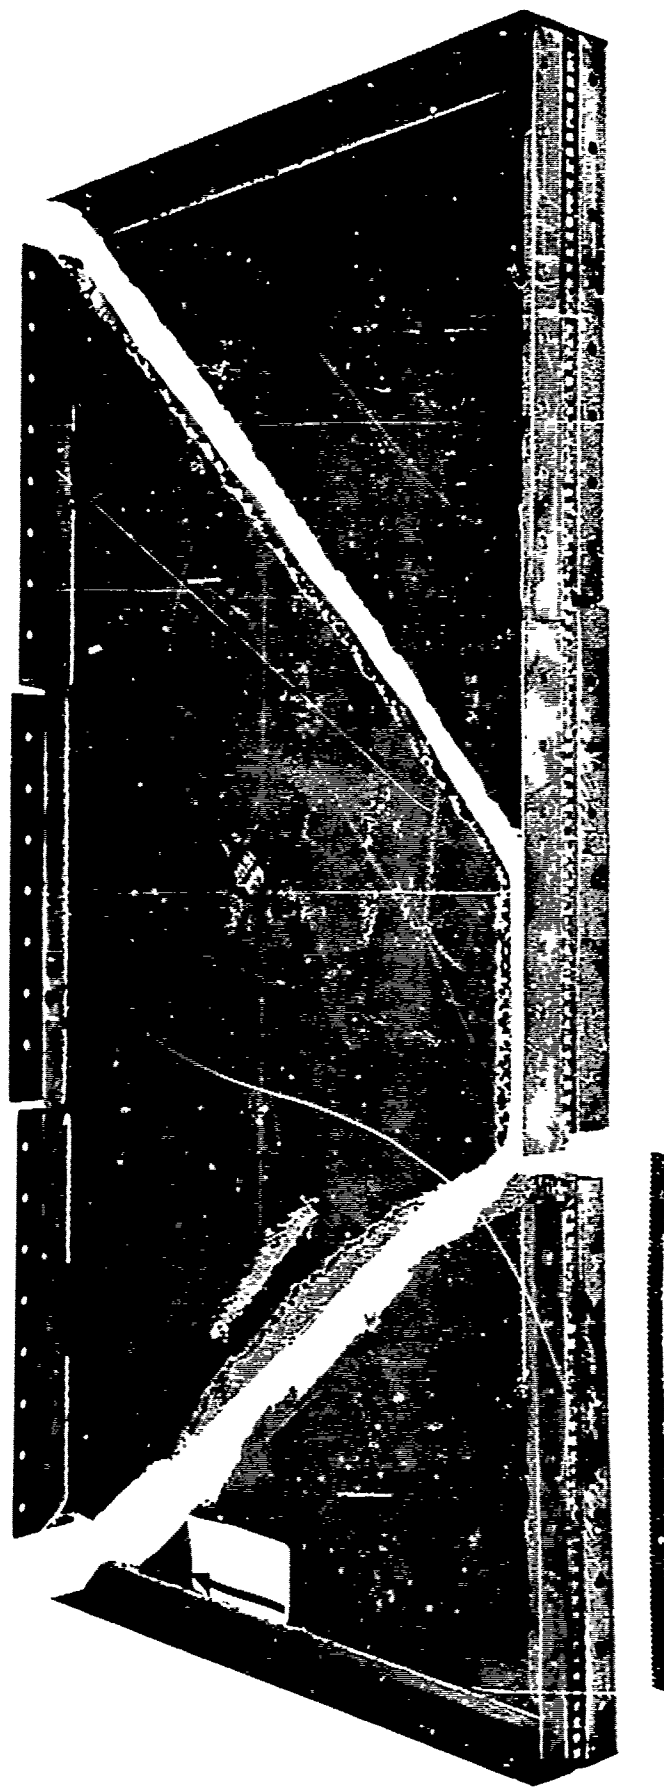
Test Specimen 3B2R1 After Failure, Inplane Shear
